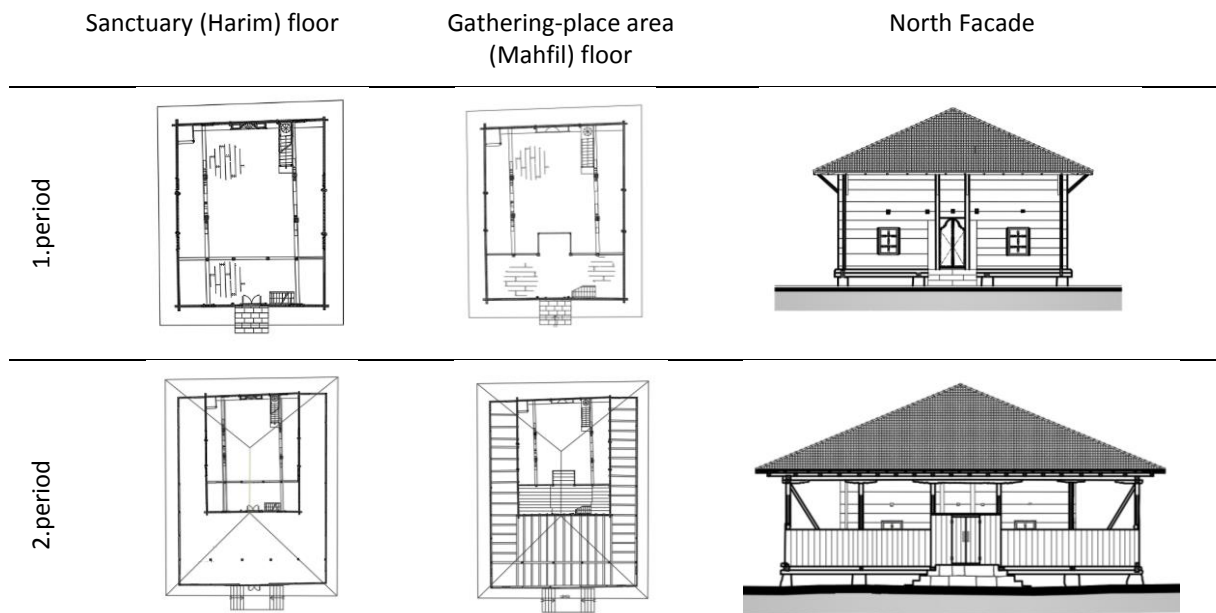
Plan, section and facade of the 1st and 2nd Period of Ordu Village Mosque (Zan Architecture, 2015a)
